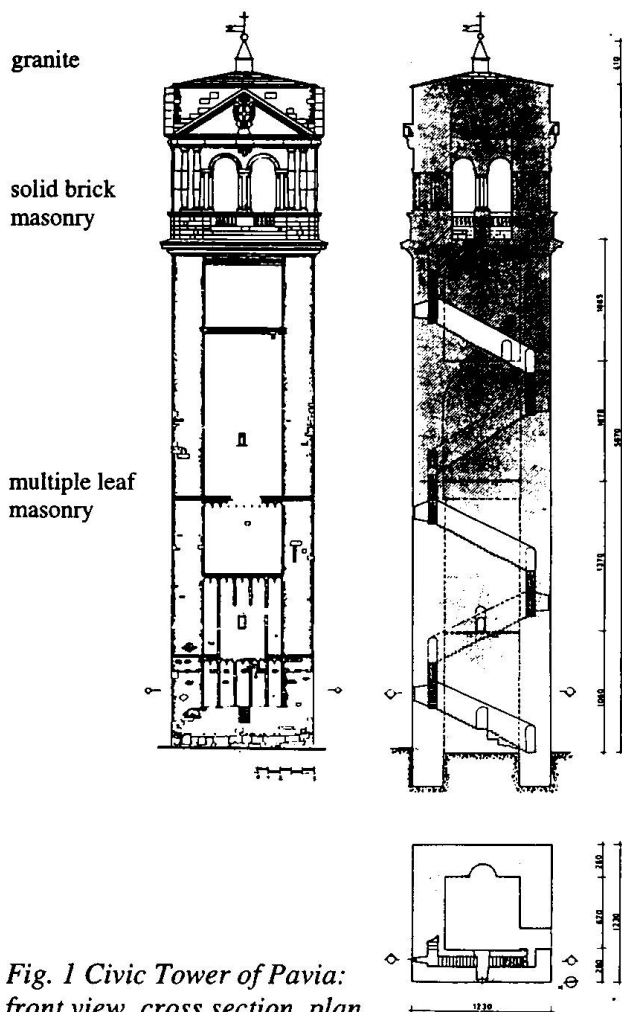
Civic Tower of Pavia: front view, cross section, plan.
